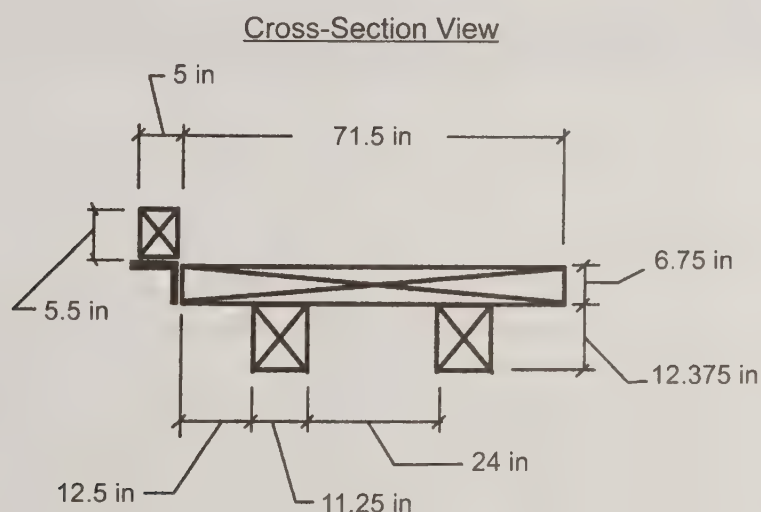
Cross-section view of Auburn's longitudinal glulam T-Section bridge for truck traffic. (Drawing provided by Steven Taylor)
